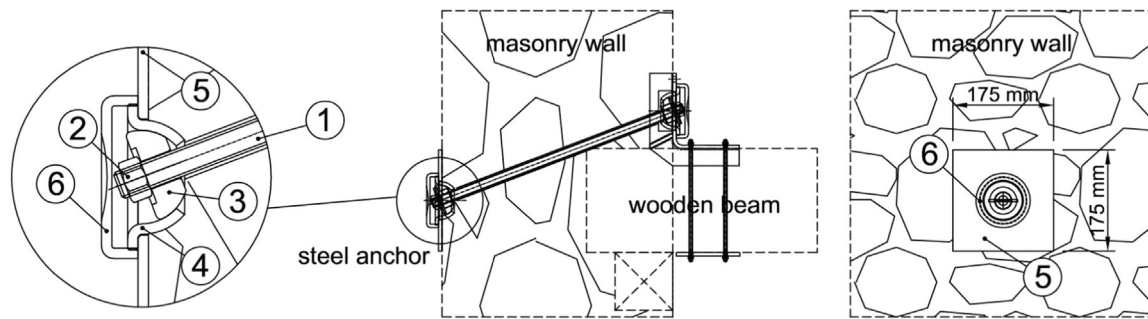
Proposed anchoring system (wall-floor connection). 1 Tie rod. 2 Screw nut. 3 Steel hinge. 4 Steel cup. 5 Steel plate. 6 Steel cover.
